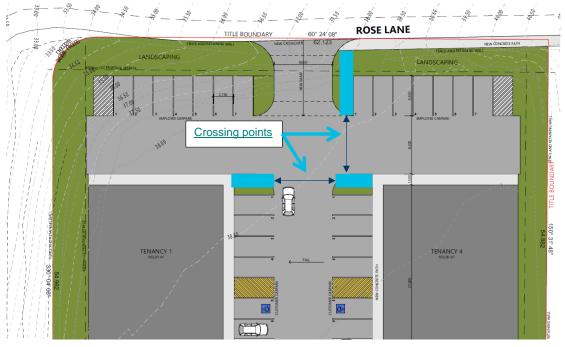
Recommended footpath extension and crossing points adjacent to main site access
